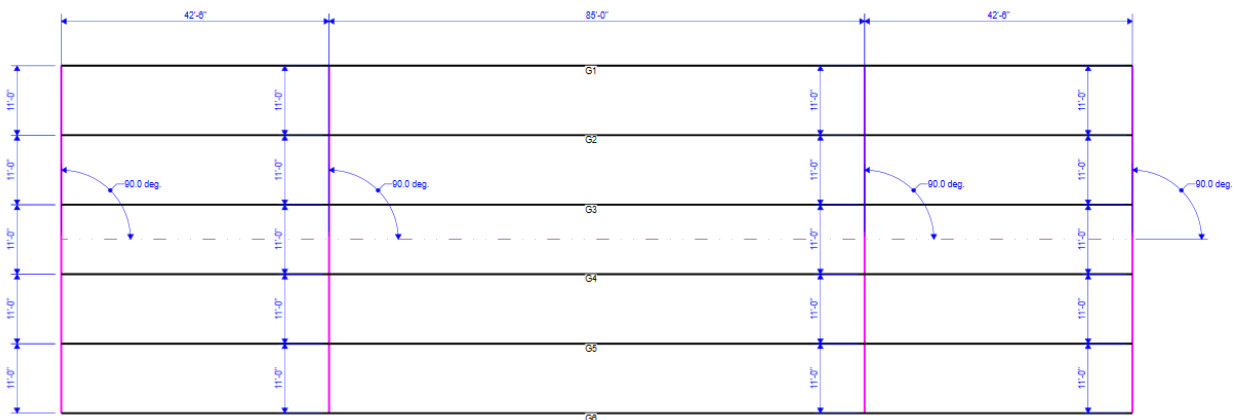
Bridge Plan View for S080 41465 (AASHTOWare™ BrR, 2023)
